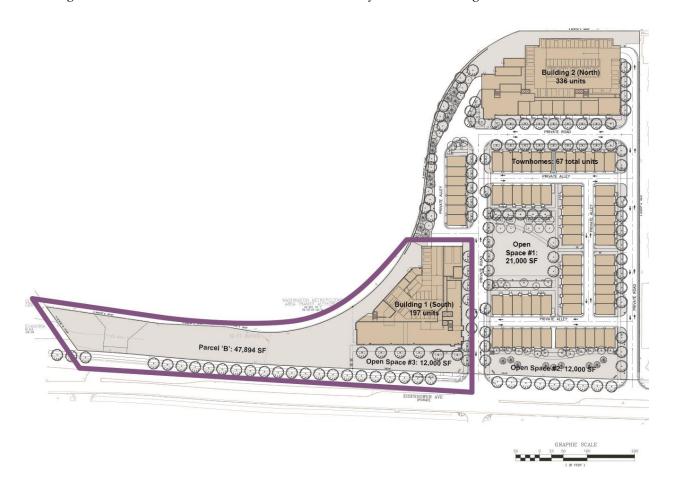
Rushmark Eisenhower South Tower Approved Final Site Plan Elevations
